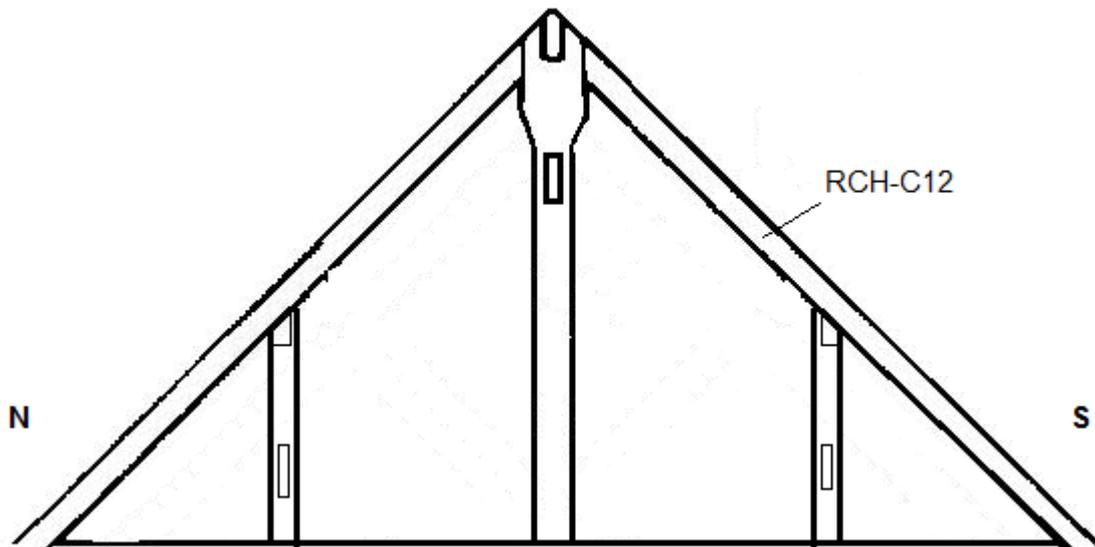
Sketch of truss 6, showing the location of sample RCH-C12
